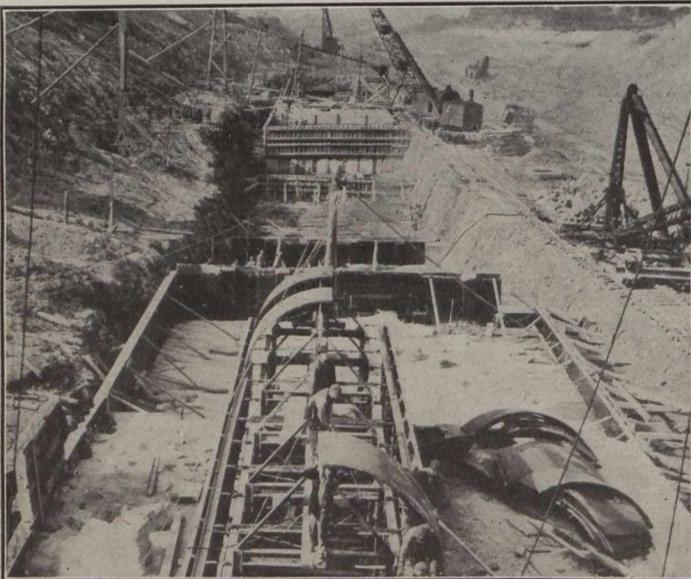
West Wall of Lock No. 2, Showing Erection of Steel Forms for Filling Tunnel.
